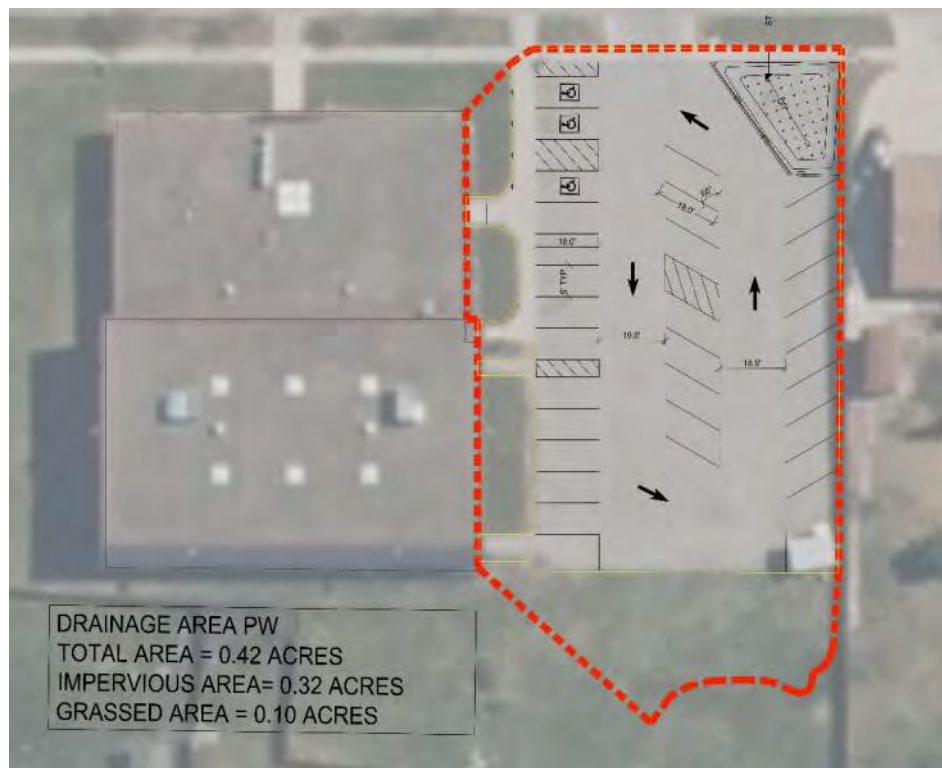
Plan View of the Pratt Willert Community Center and Drainage Area
